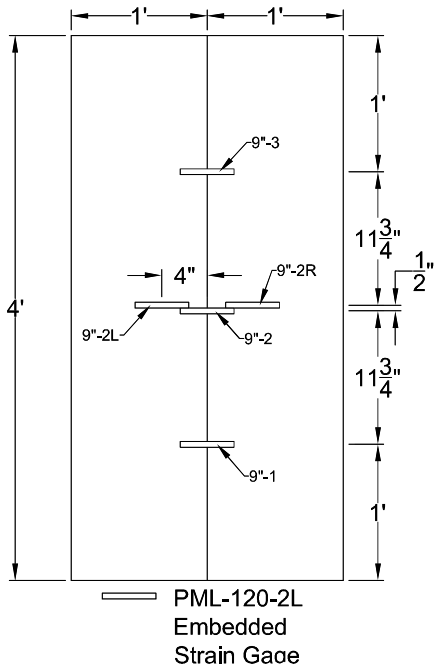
Plan View of Strain Gages 9 in. Above Bottom of Precast (All Specimens)
